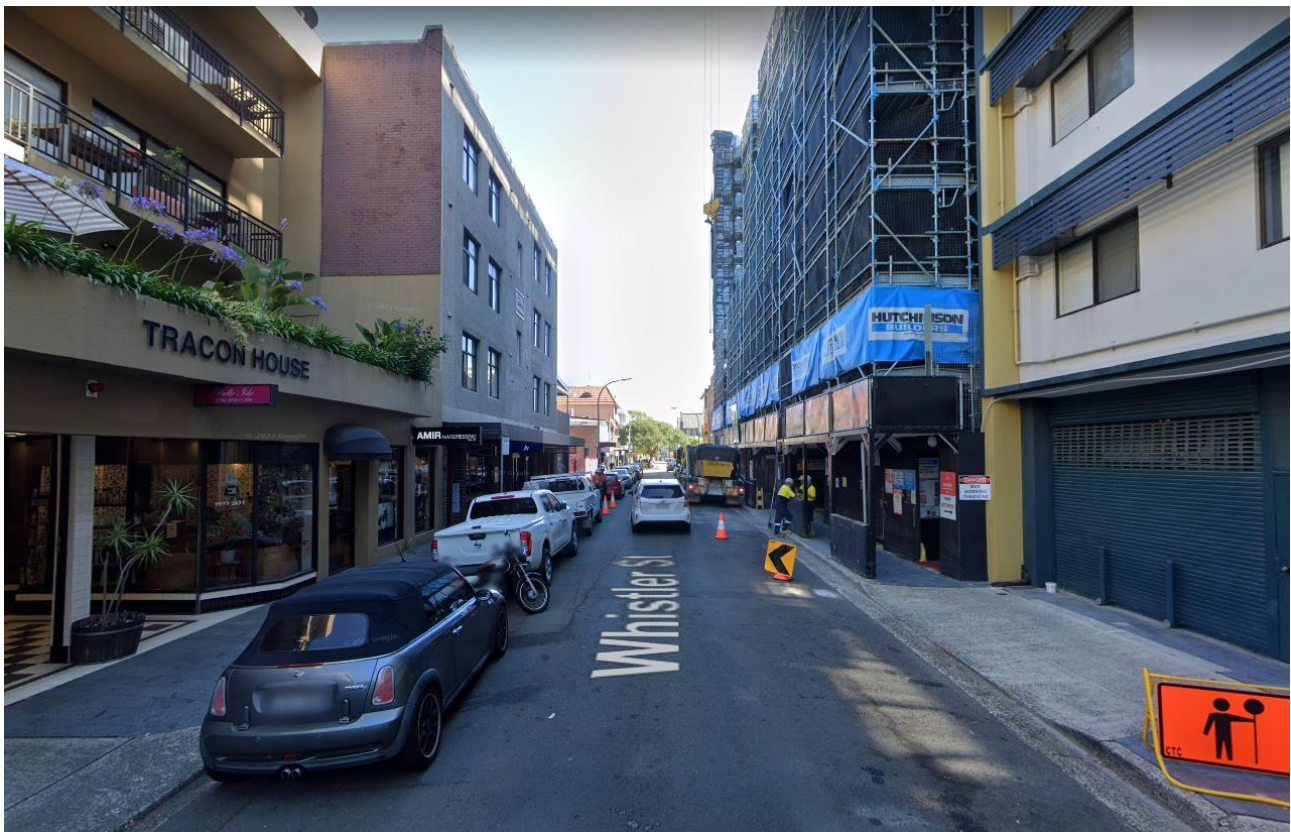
Whistler Street, viewed facing north from the rear of 'Tracon House' at no. 27 Belgrave Street)
